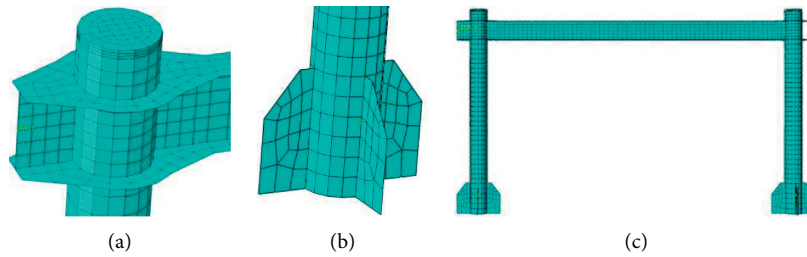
Solid finite element model. (a) Joint. (b) Column foot. (c) Frame.
